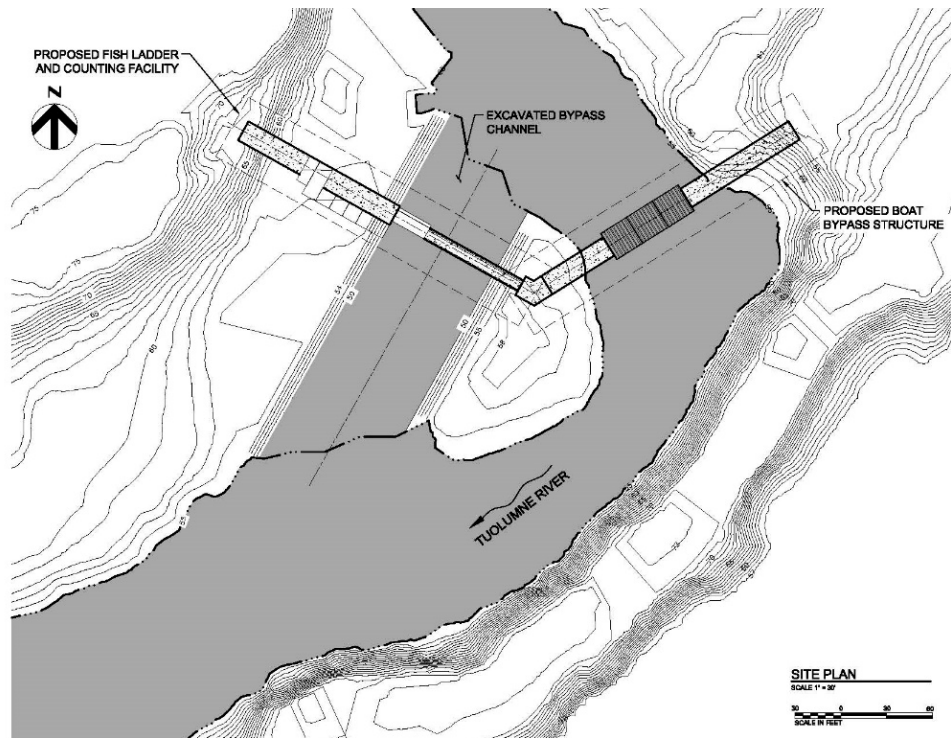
Plan view of the fish counting and barrier weir at RM 25.5.
